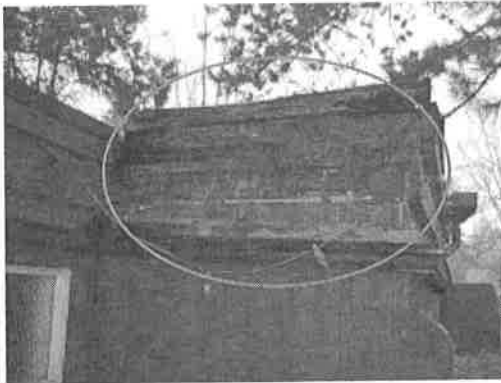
South Face of the East Elevation Roof Curb and Wall Framing At The Low Slope Roof Area
